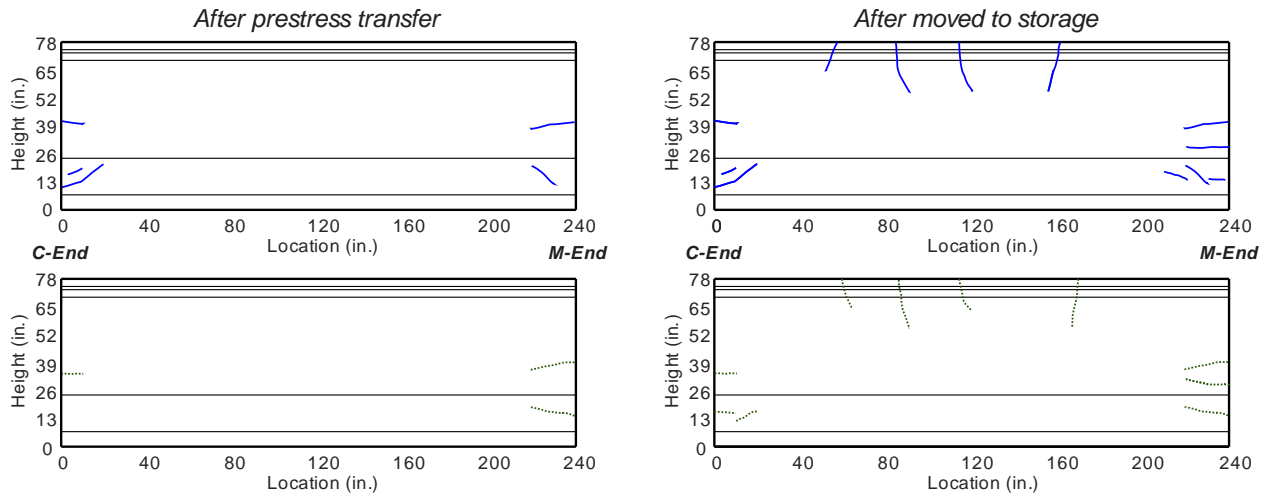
PP-50 before and after transporting to storage crack patterns shown on North face of specimen. Solid blue lines depict cracks visible on the North face and dashed green lines depict cracks visible on the South face.
